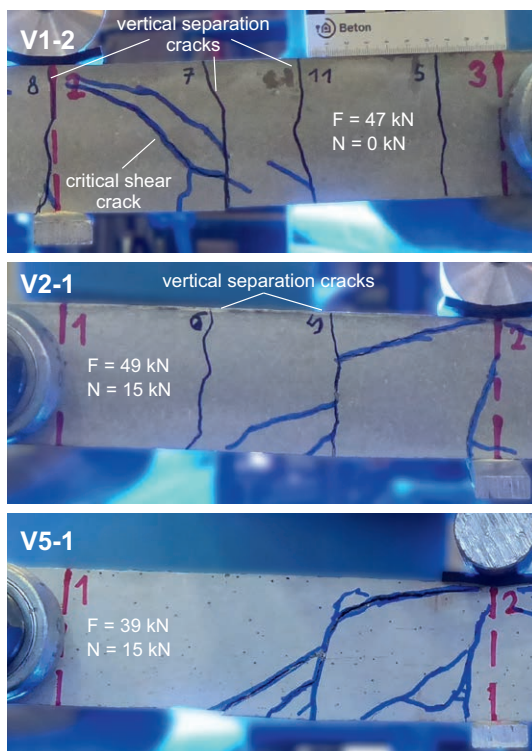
Crack shape and corresponding crack load for specimen with and without separation cracks | graphic: Jan Bielak
